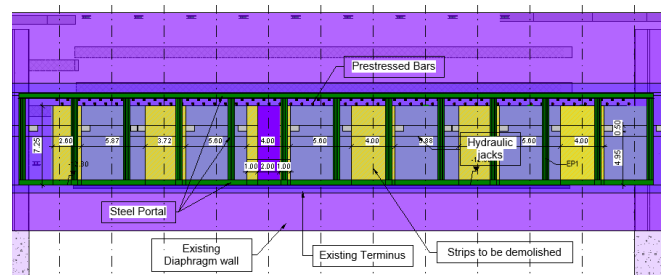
Elevated: Cut&Cover excavation, demolitions, and load transfer procedure solution.
